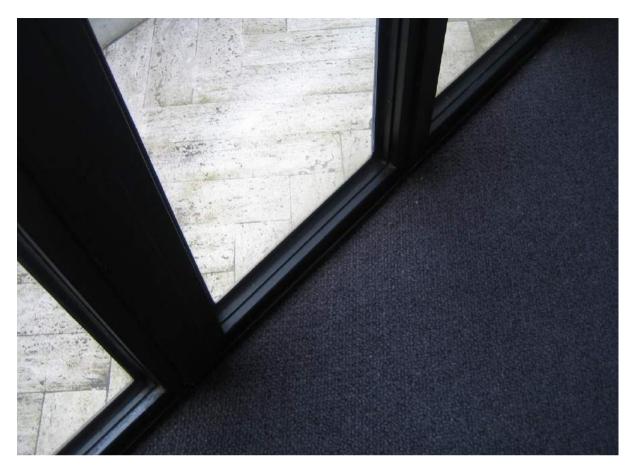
Water penetration and damage within bedroom 2 from balcony door in Unit 407.
